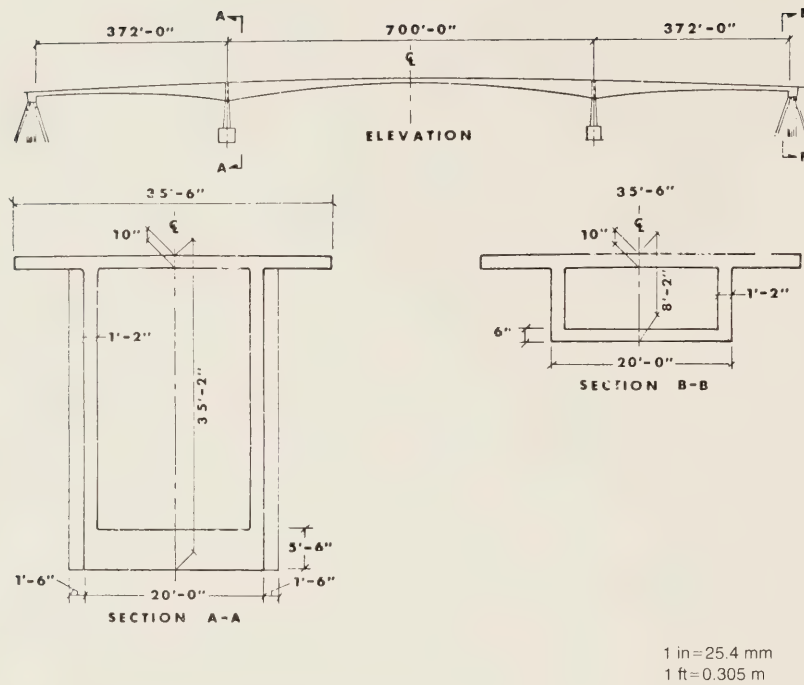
Overall dimensions of the free cantilever Shubenacadie Bridge.
